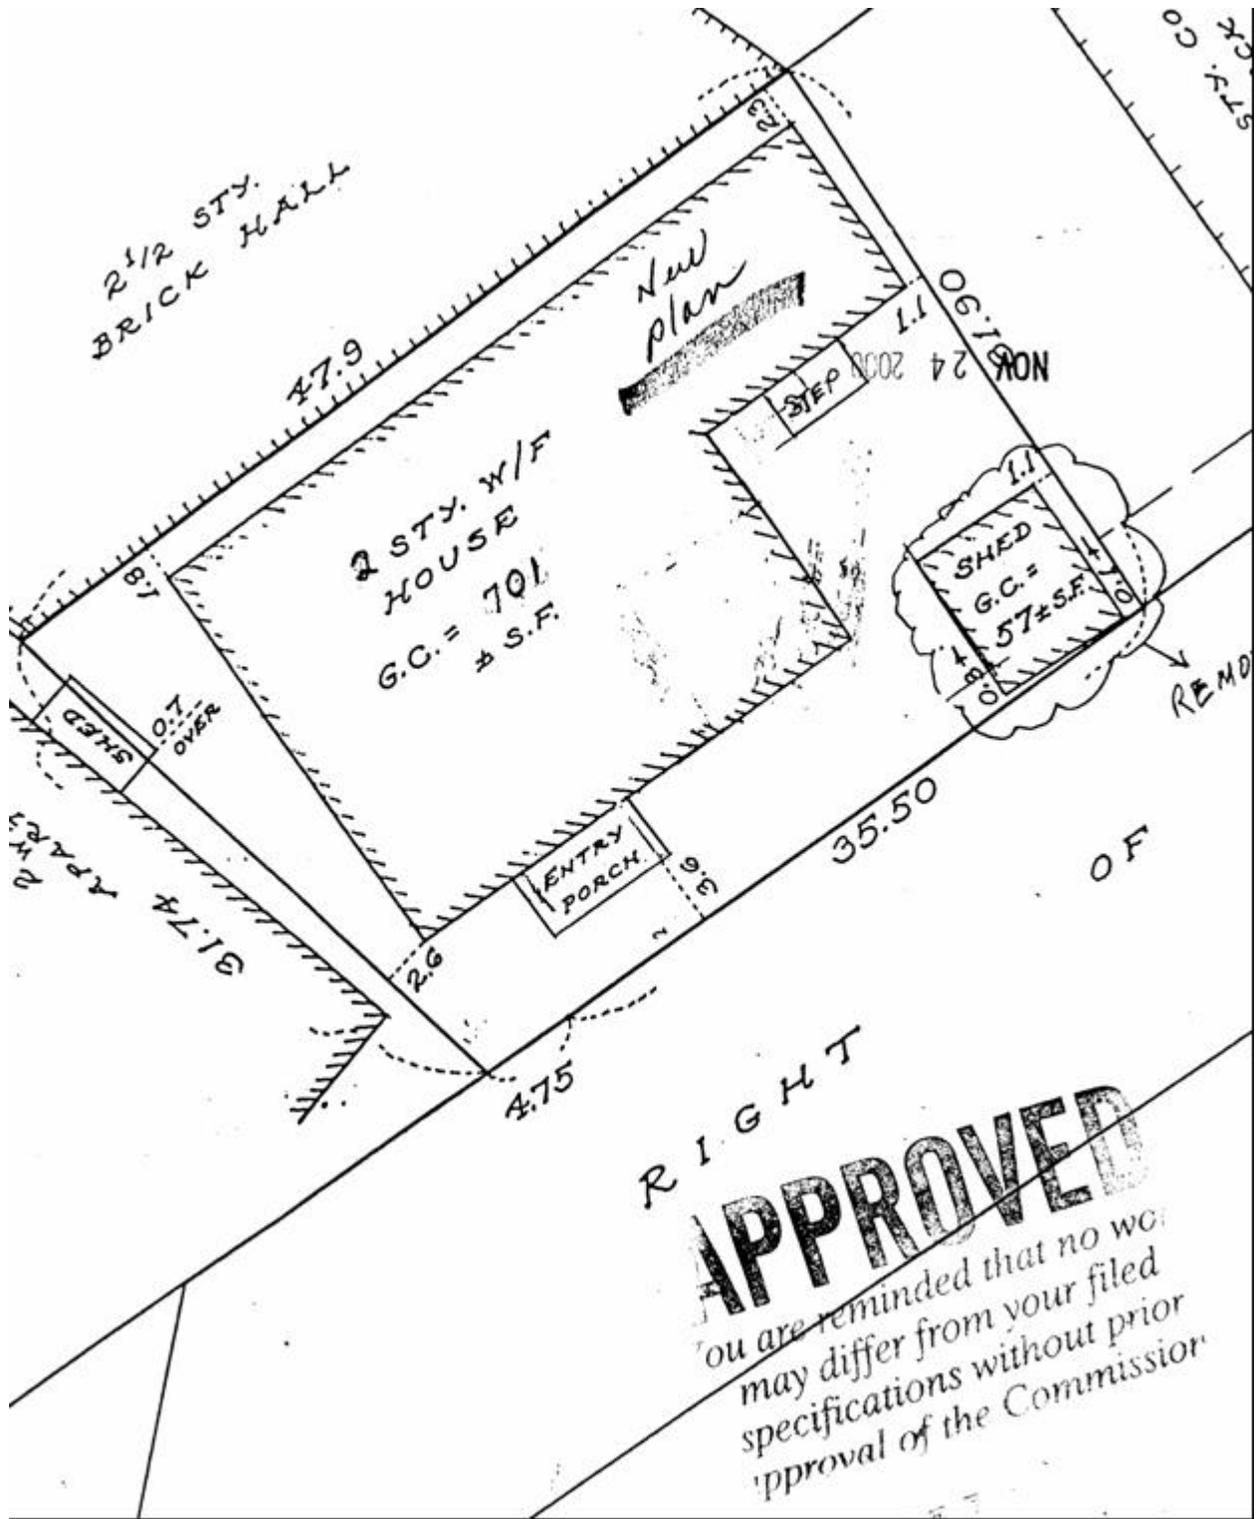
3 Coffin Street. Footprint of new construction. Courtesy of Nantucket HDC.
